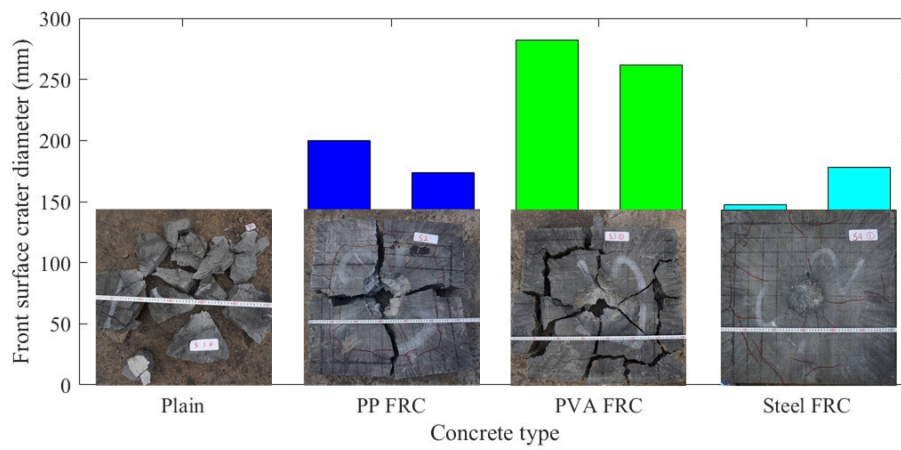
Damage mode of concrete panels without/with fiber reinforcement.
